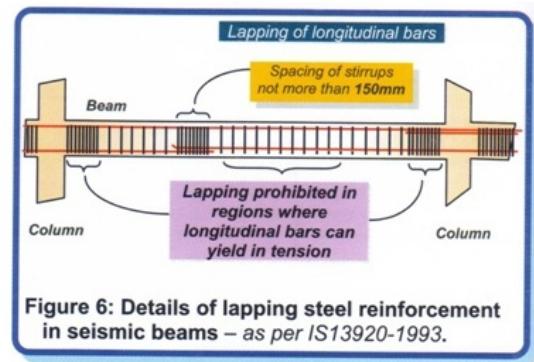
Details of lapping steel reinforcement in seismic beams – as per IS13920-1993.
